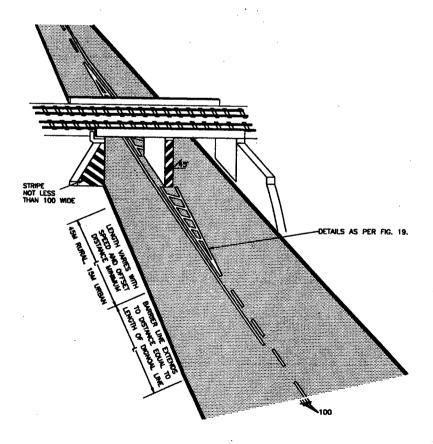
Typical Markings on Objects in and Adjacent to the Roadway (Ref. Para 13.2.1)
